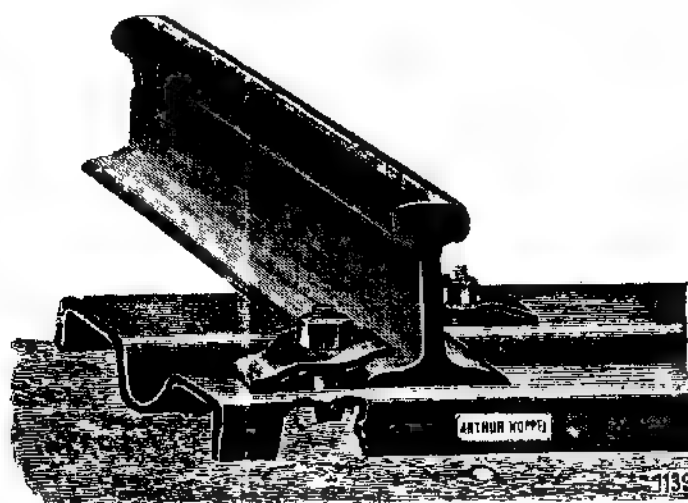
CLIP AND BOLT FASTENING FOR ATTACHING RAILS TO SLEEPERS.
